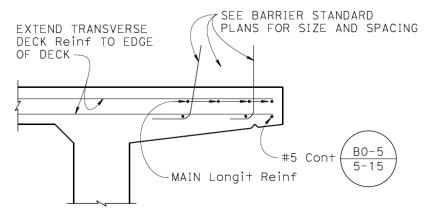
Barrier and Sidewalk Minimum Longitudinal Reinforcement
